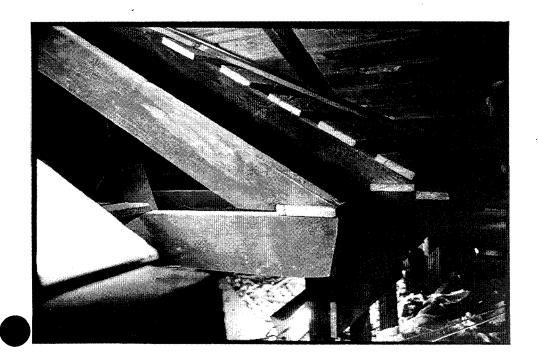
RAFTER AT JOIST END FRAM-ING
